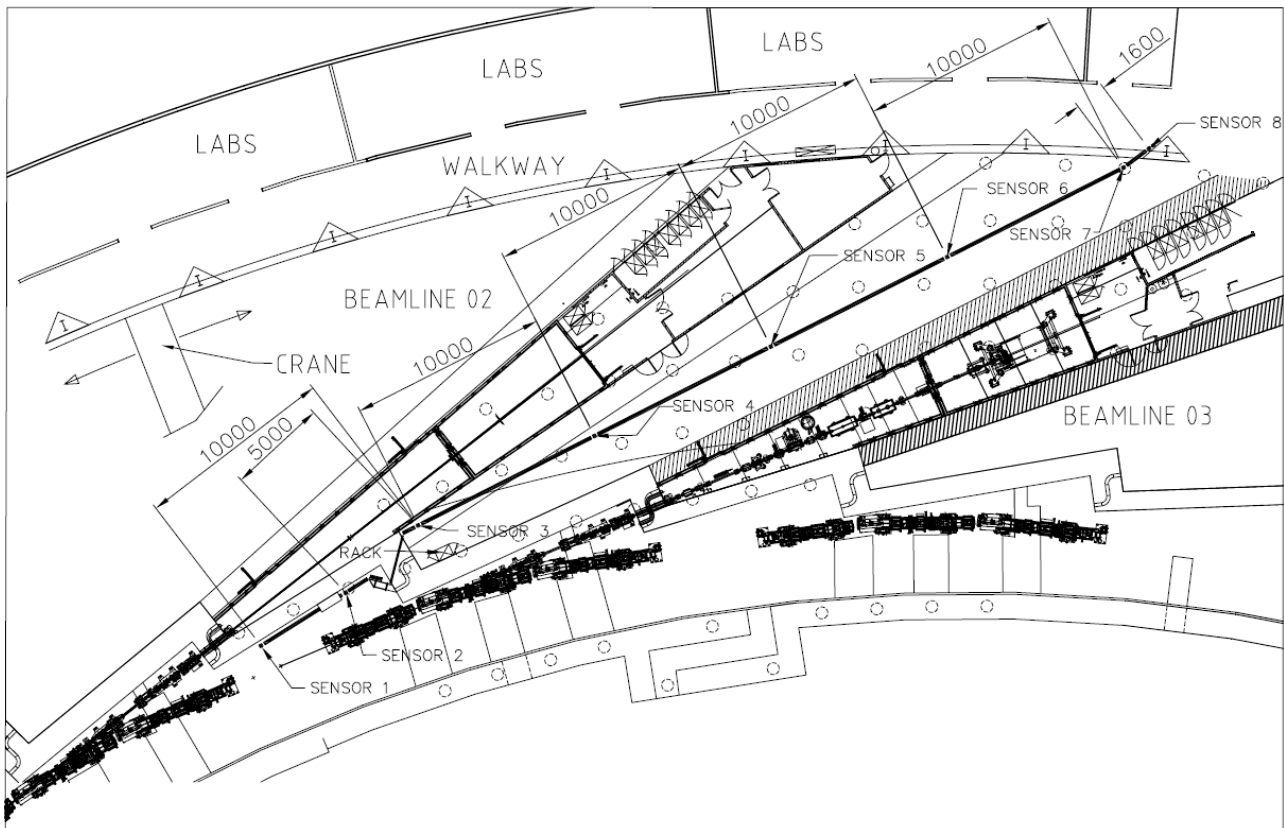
Diamond HLS Installation between 2 Existing Beamlines
